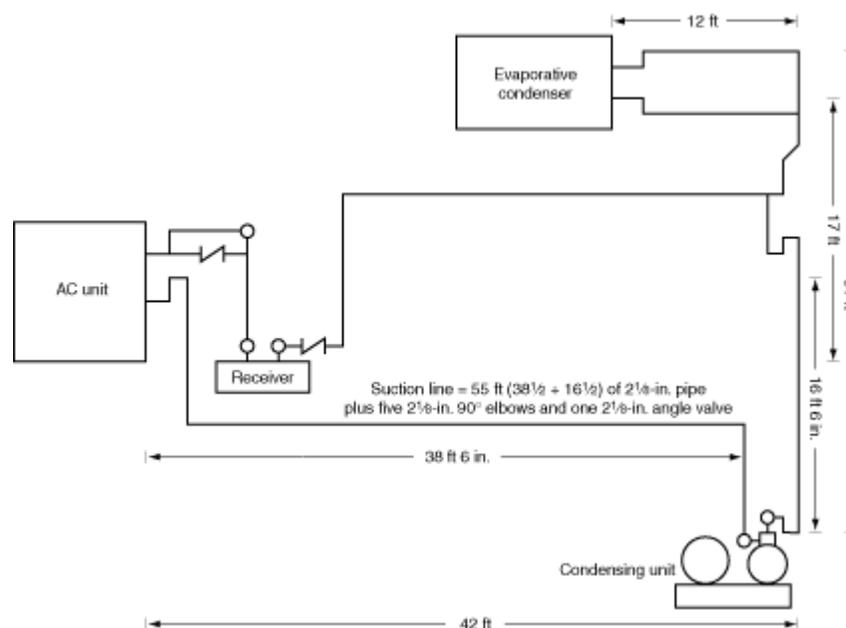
F16 Typical 15 HP air-conditioning installation with dimensioned piping layout.
